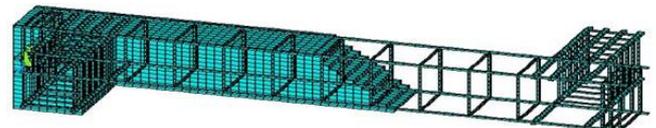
Present verification model simulation with steel reinforcement and meshing.
